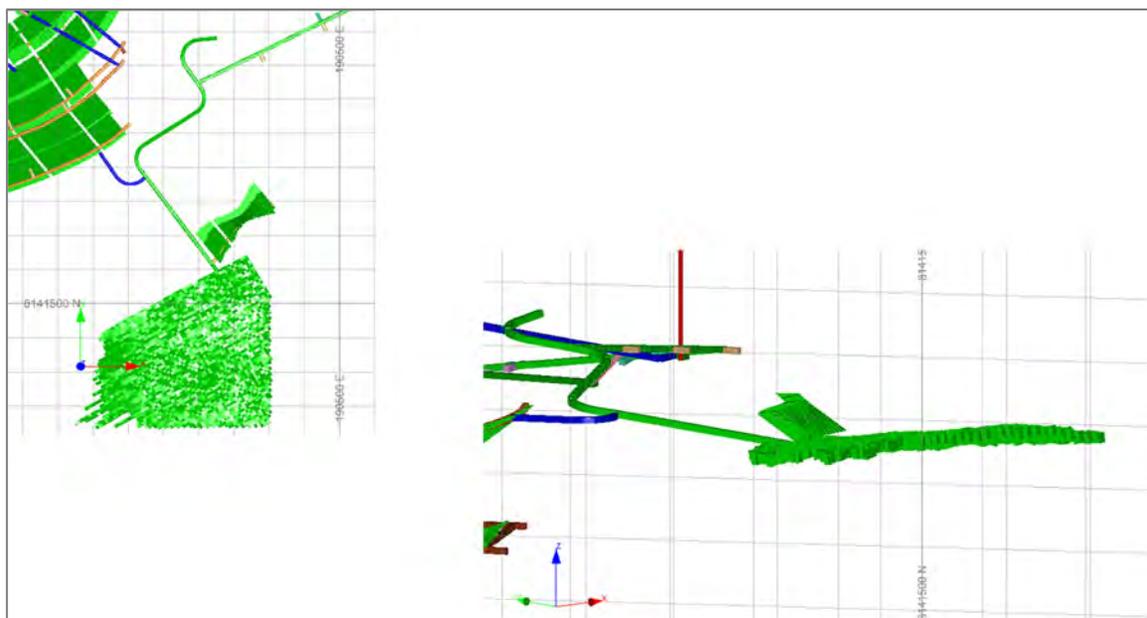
Connection Between the Development Structures and Room-and-Pillar Stopes
